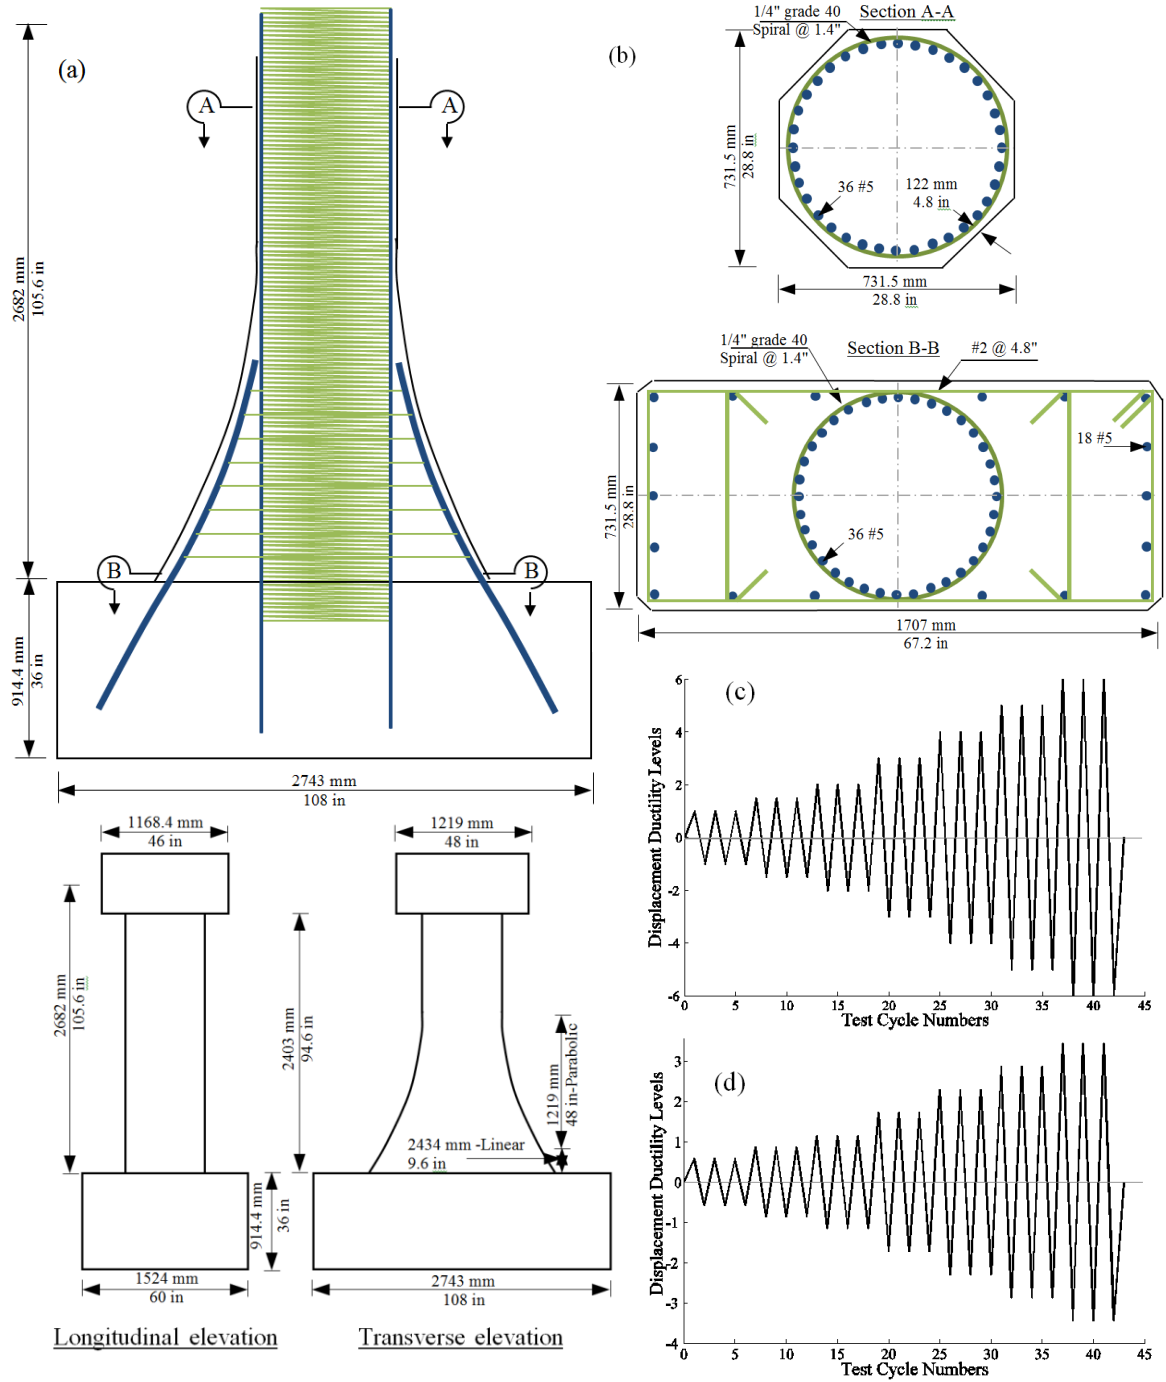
(a) Details of the column design, (b) Reinforcement detailing, (c) Displacement ductility levels for prismatic column, (d) Displacement ductility levels for flared column
